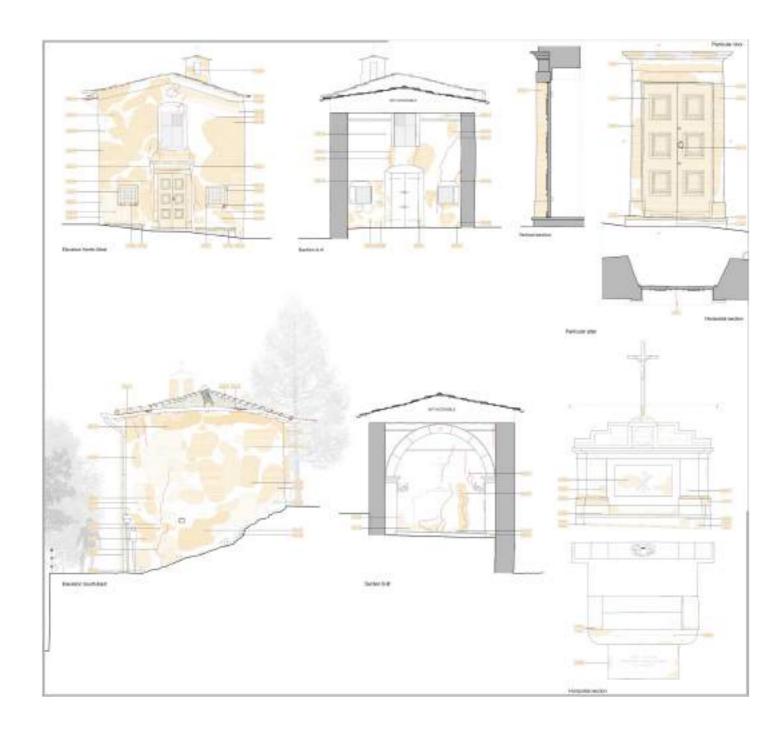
Conservation interventions: elevations North-West (façade) and South-East (apse).
